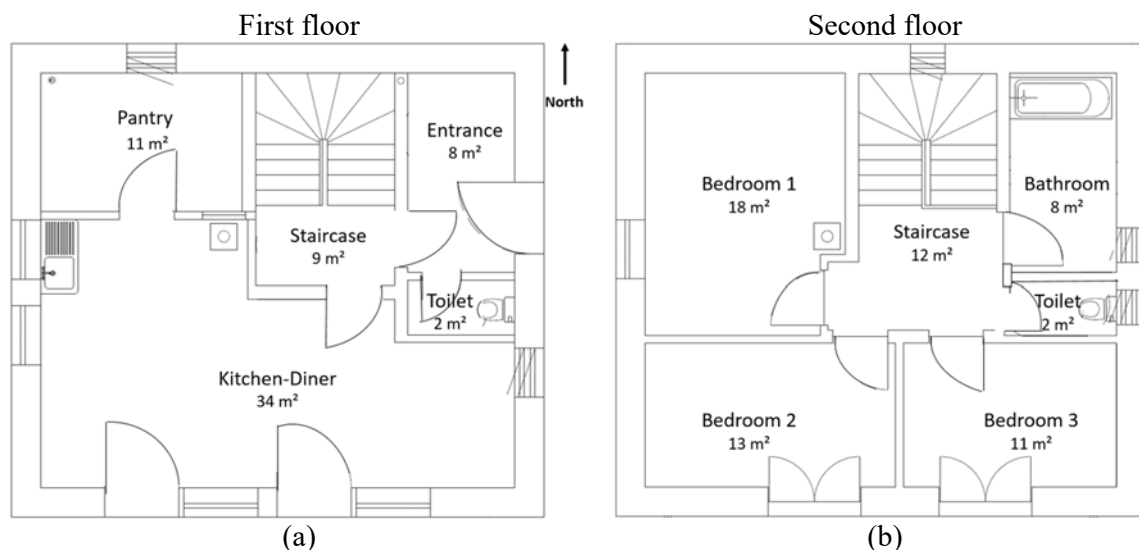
Plan of the house used in simulation (a) first floor and (b) second floor.
